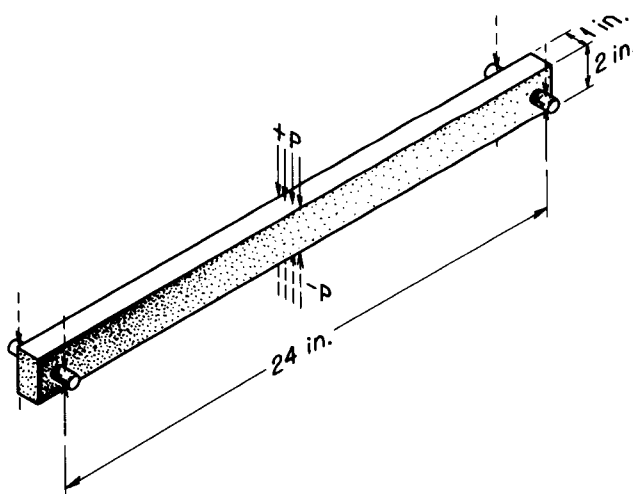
Simply supported beam specimen [dimensions shown are nominal (1 in. = 25.4 mm)].
